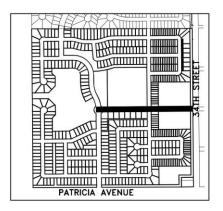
NORTH-SOUTH COLLECTOR STREET - PLATEAU EXTENSION
